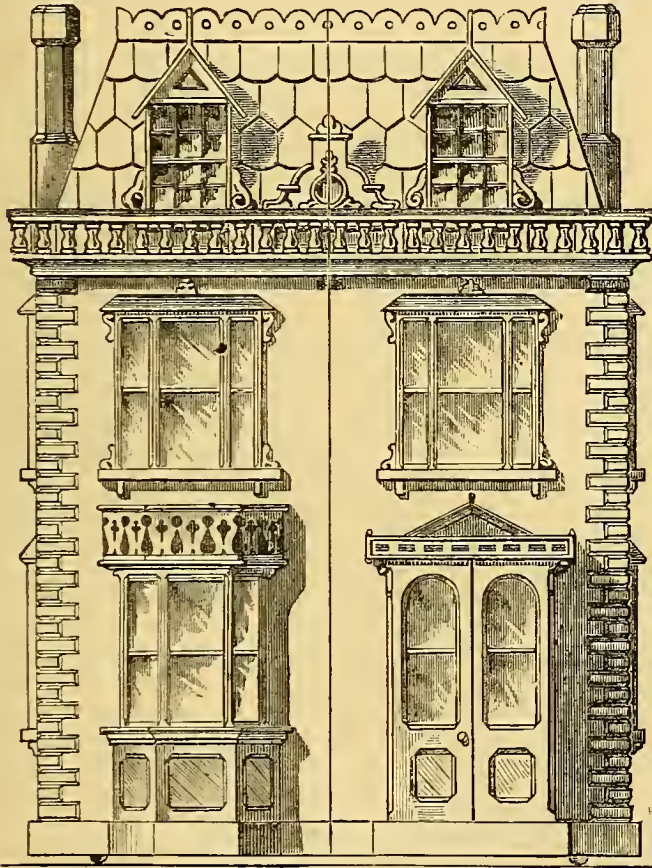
FRONT ELEVATION OF DOLL'S HOUSE.
